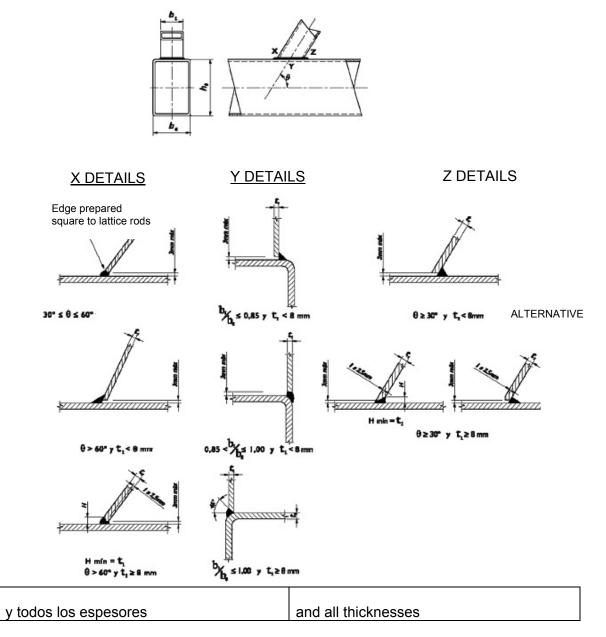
b Weld preparation and fit-up Construction details of typical welds rectangular hollow sections
